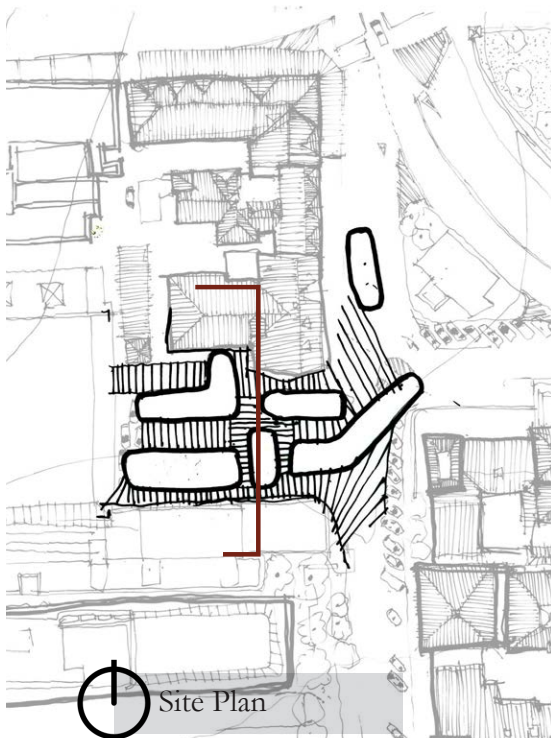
Site plan depicting potential position of building on site (Author, 2018)
